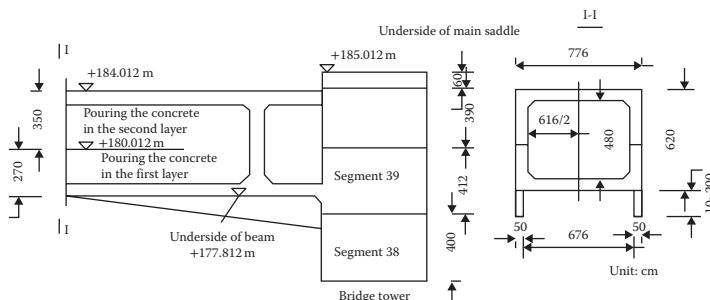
Crossbeam structure and layered concrete, Yangluo Bridge. (From Zhang, M. et al., *Bridge Constr.*, 6, 2006.)
